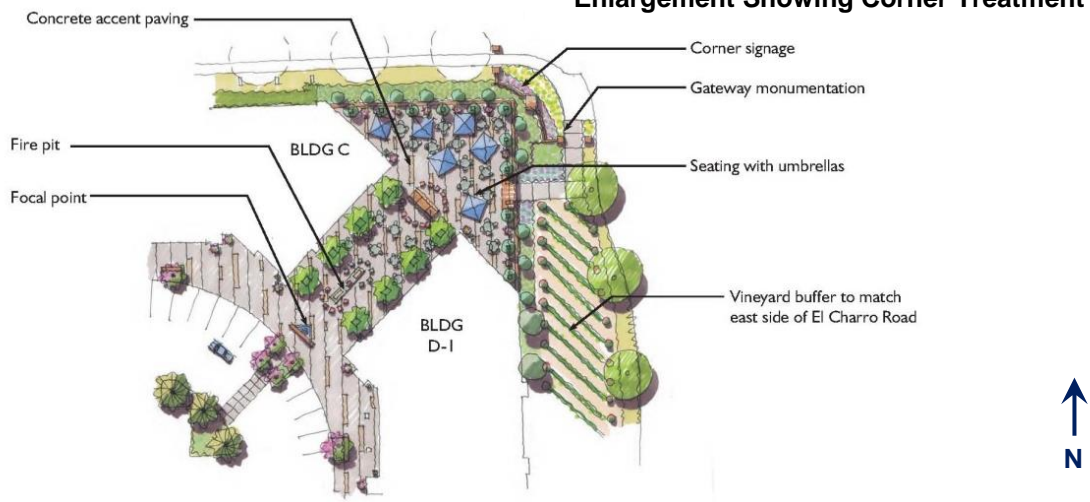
Landscaping Plan and Enlargement of Northeastern Corner of Site
